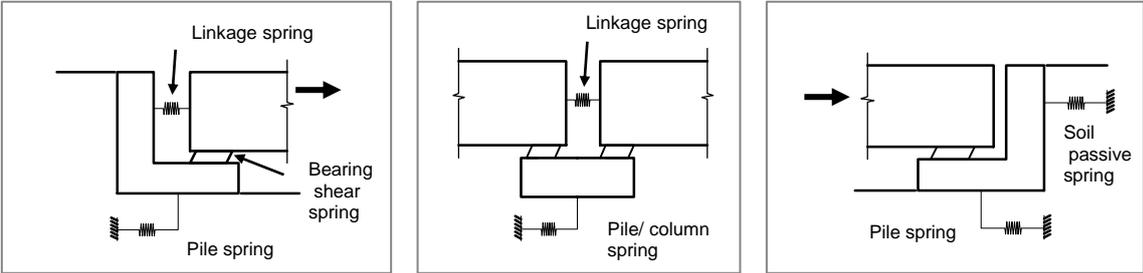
Stiffness elements used in longitudinal response model. Left – pull abutment. Centre – piers. Right – push abutment.
